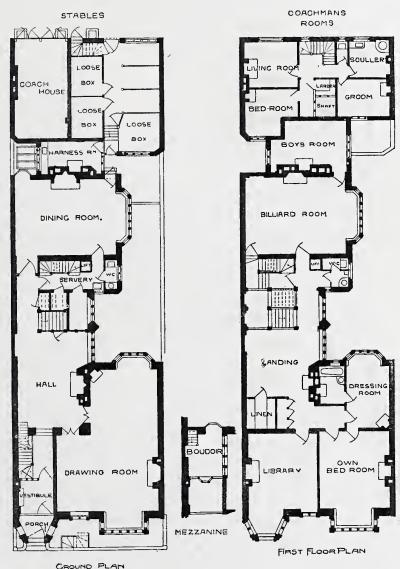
PLANS OF A TOWN HOUSE. ERNEST GEORGE AND PETO, ARCHITECTS, 1887.
